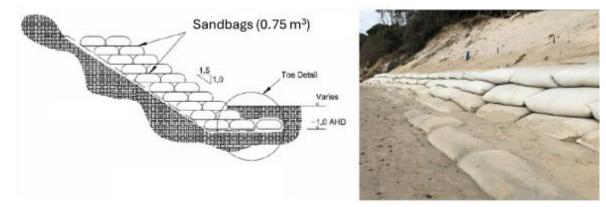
Sandbag revetment wall – left: typical cross-section (revetment height varies, adapted from Coghlan *et al.* (2009)), right: sandbag revetment wall at Clarkes Beach, Byron Bay (image: J. Carley)
